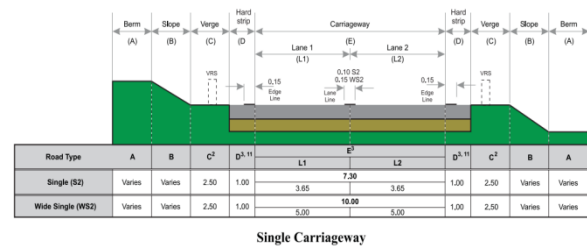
Dimensions of cross-section components for rural all-purpose road machine
